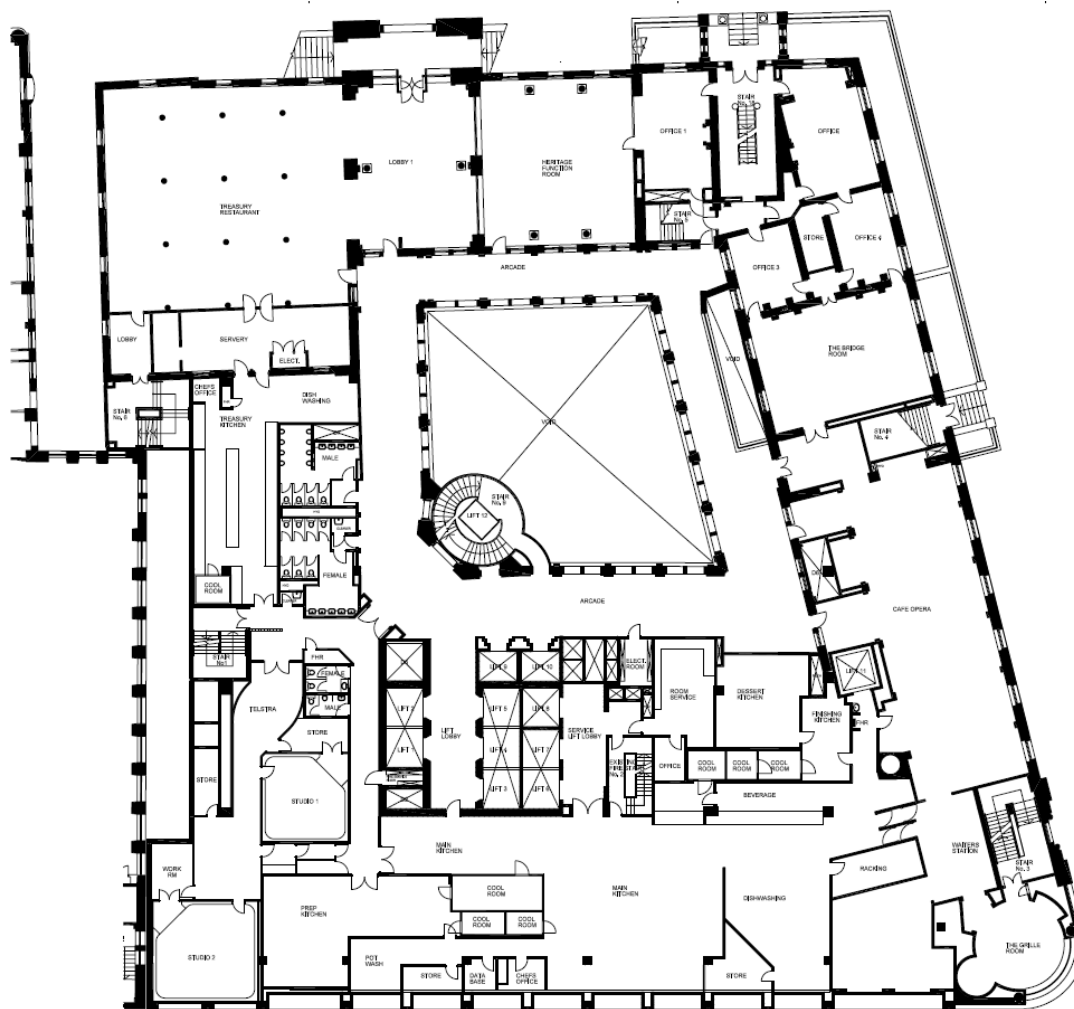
Extract of accommodation survey from 2004: Ground Floor Plan
